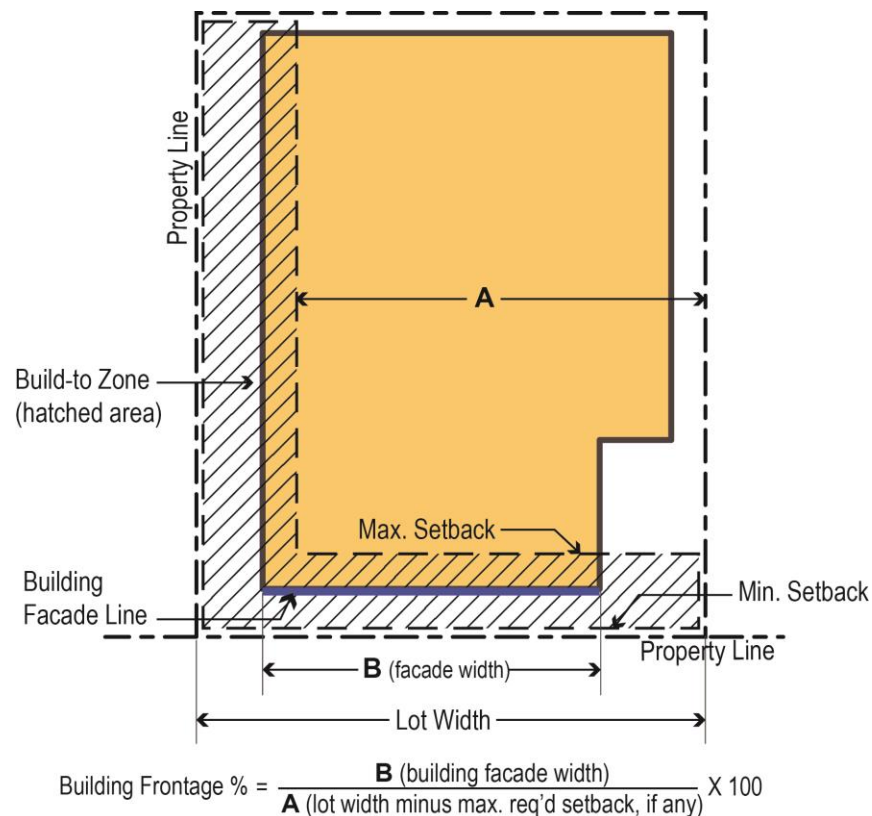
Percent of building façade required to be constructed within the build-to zone.
